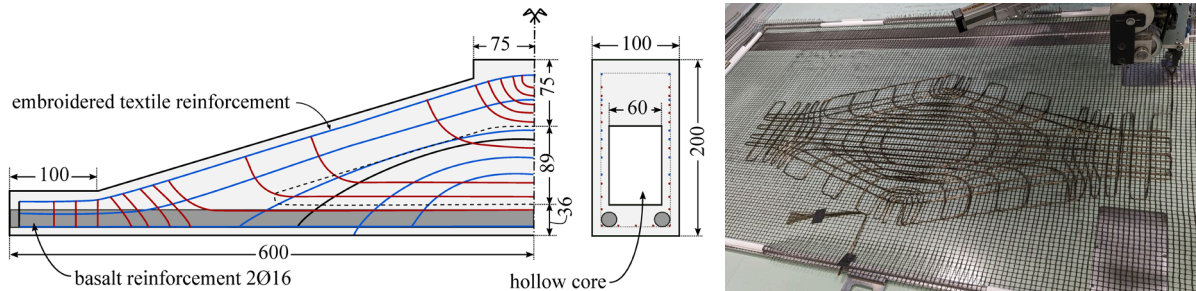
(a) Conceptual design of the basalt-reinforced concrete beam and (b) Fabrication of stress-aligned basalt textile reinforcement by embroidery technology (Figure taken with permission of Fiber Elements GmbH © 2023)
